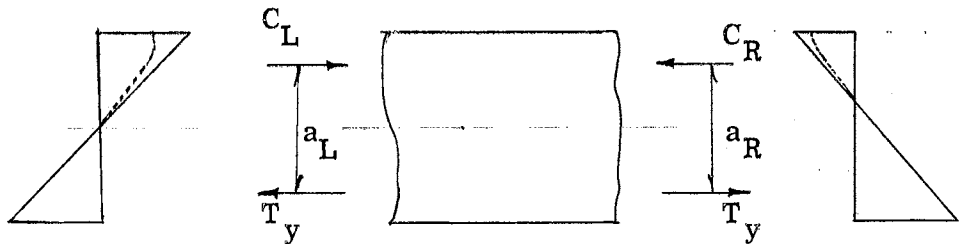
Equilibrium of Element of Beam at Ultimate
